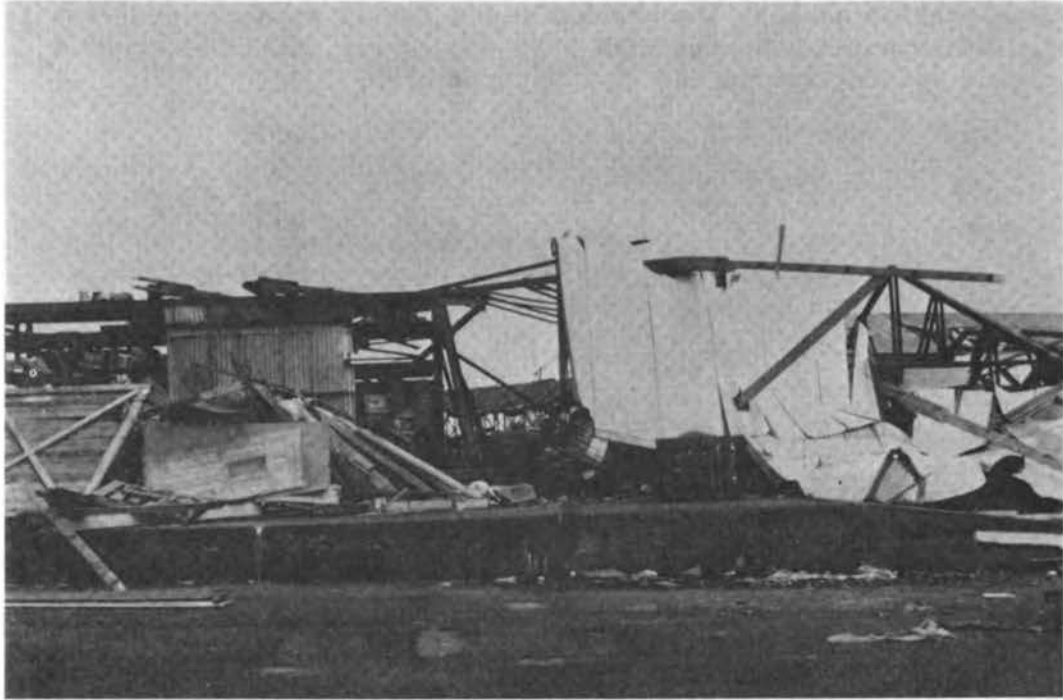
Wind damage to timber-framed warehouse structure at Port Allen, Kauai.
